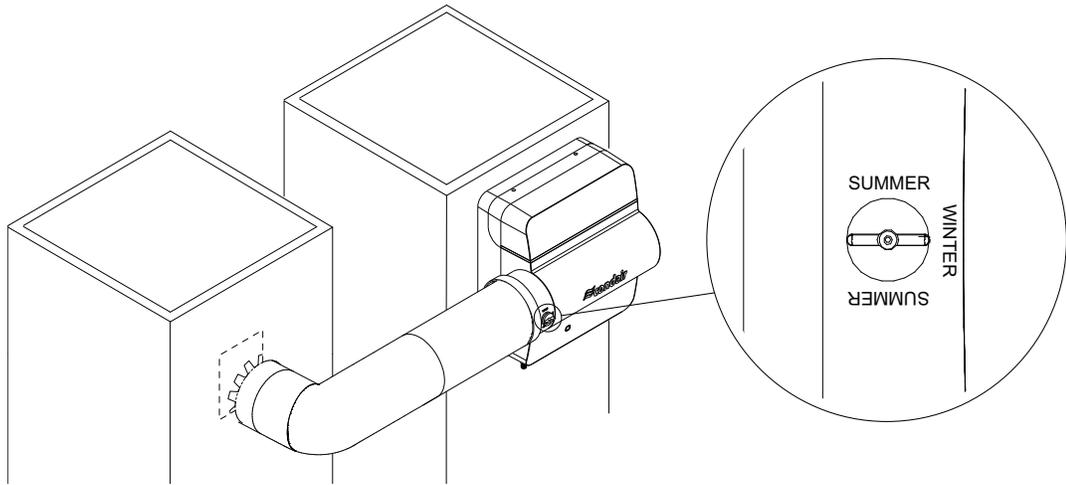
Bypass Duct (not supplied) and Damper Switch
